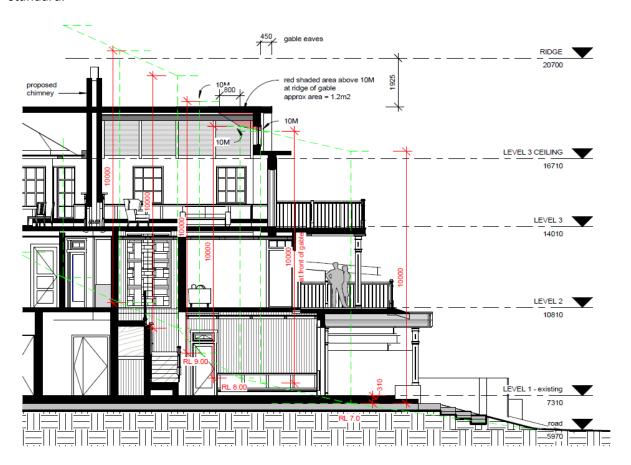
Section extract to indicate area of dwelling roof exceeding the 10m height control
